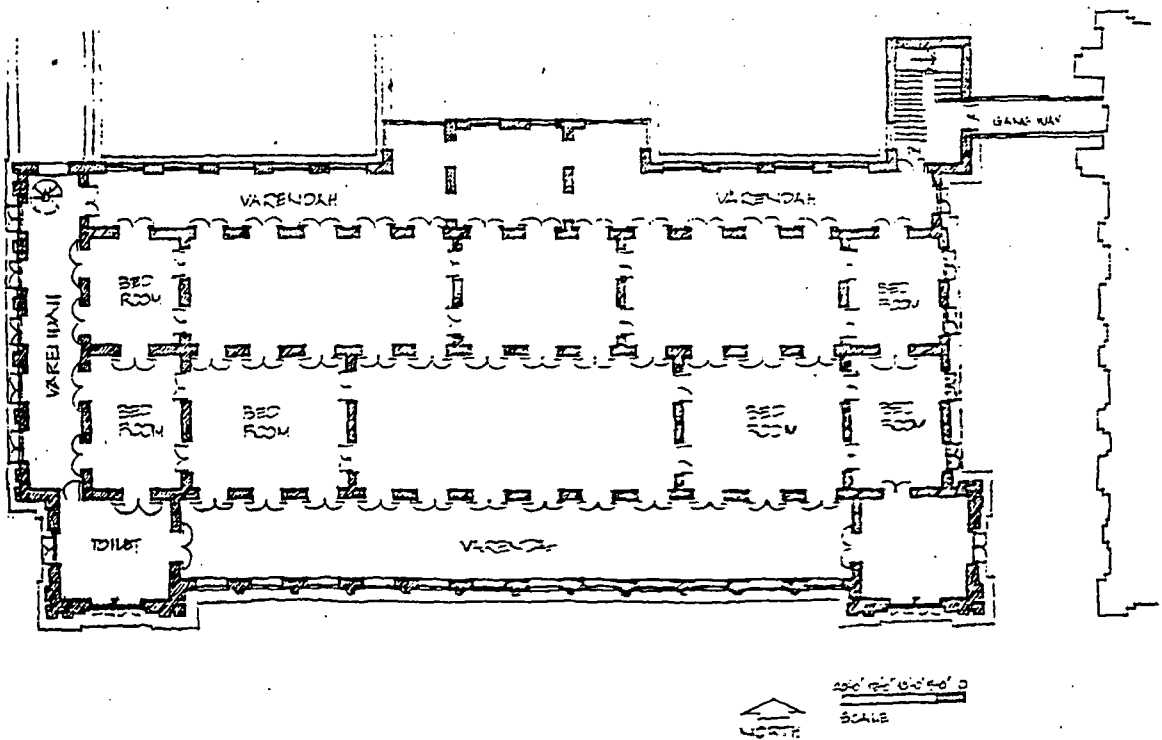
First floor plan, Jenana Mahal Ahsan manjil, Dhaka
